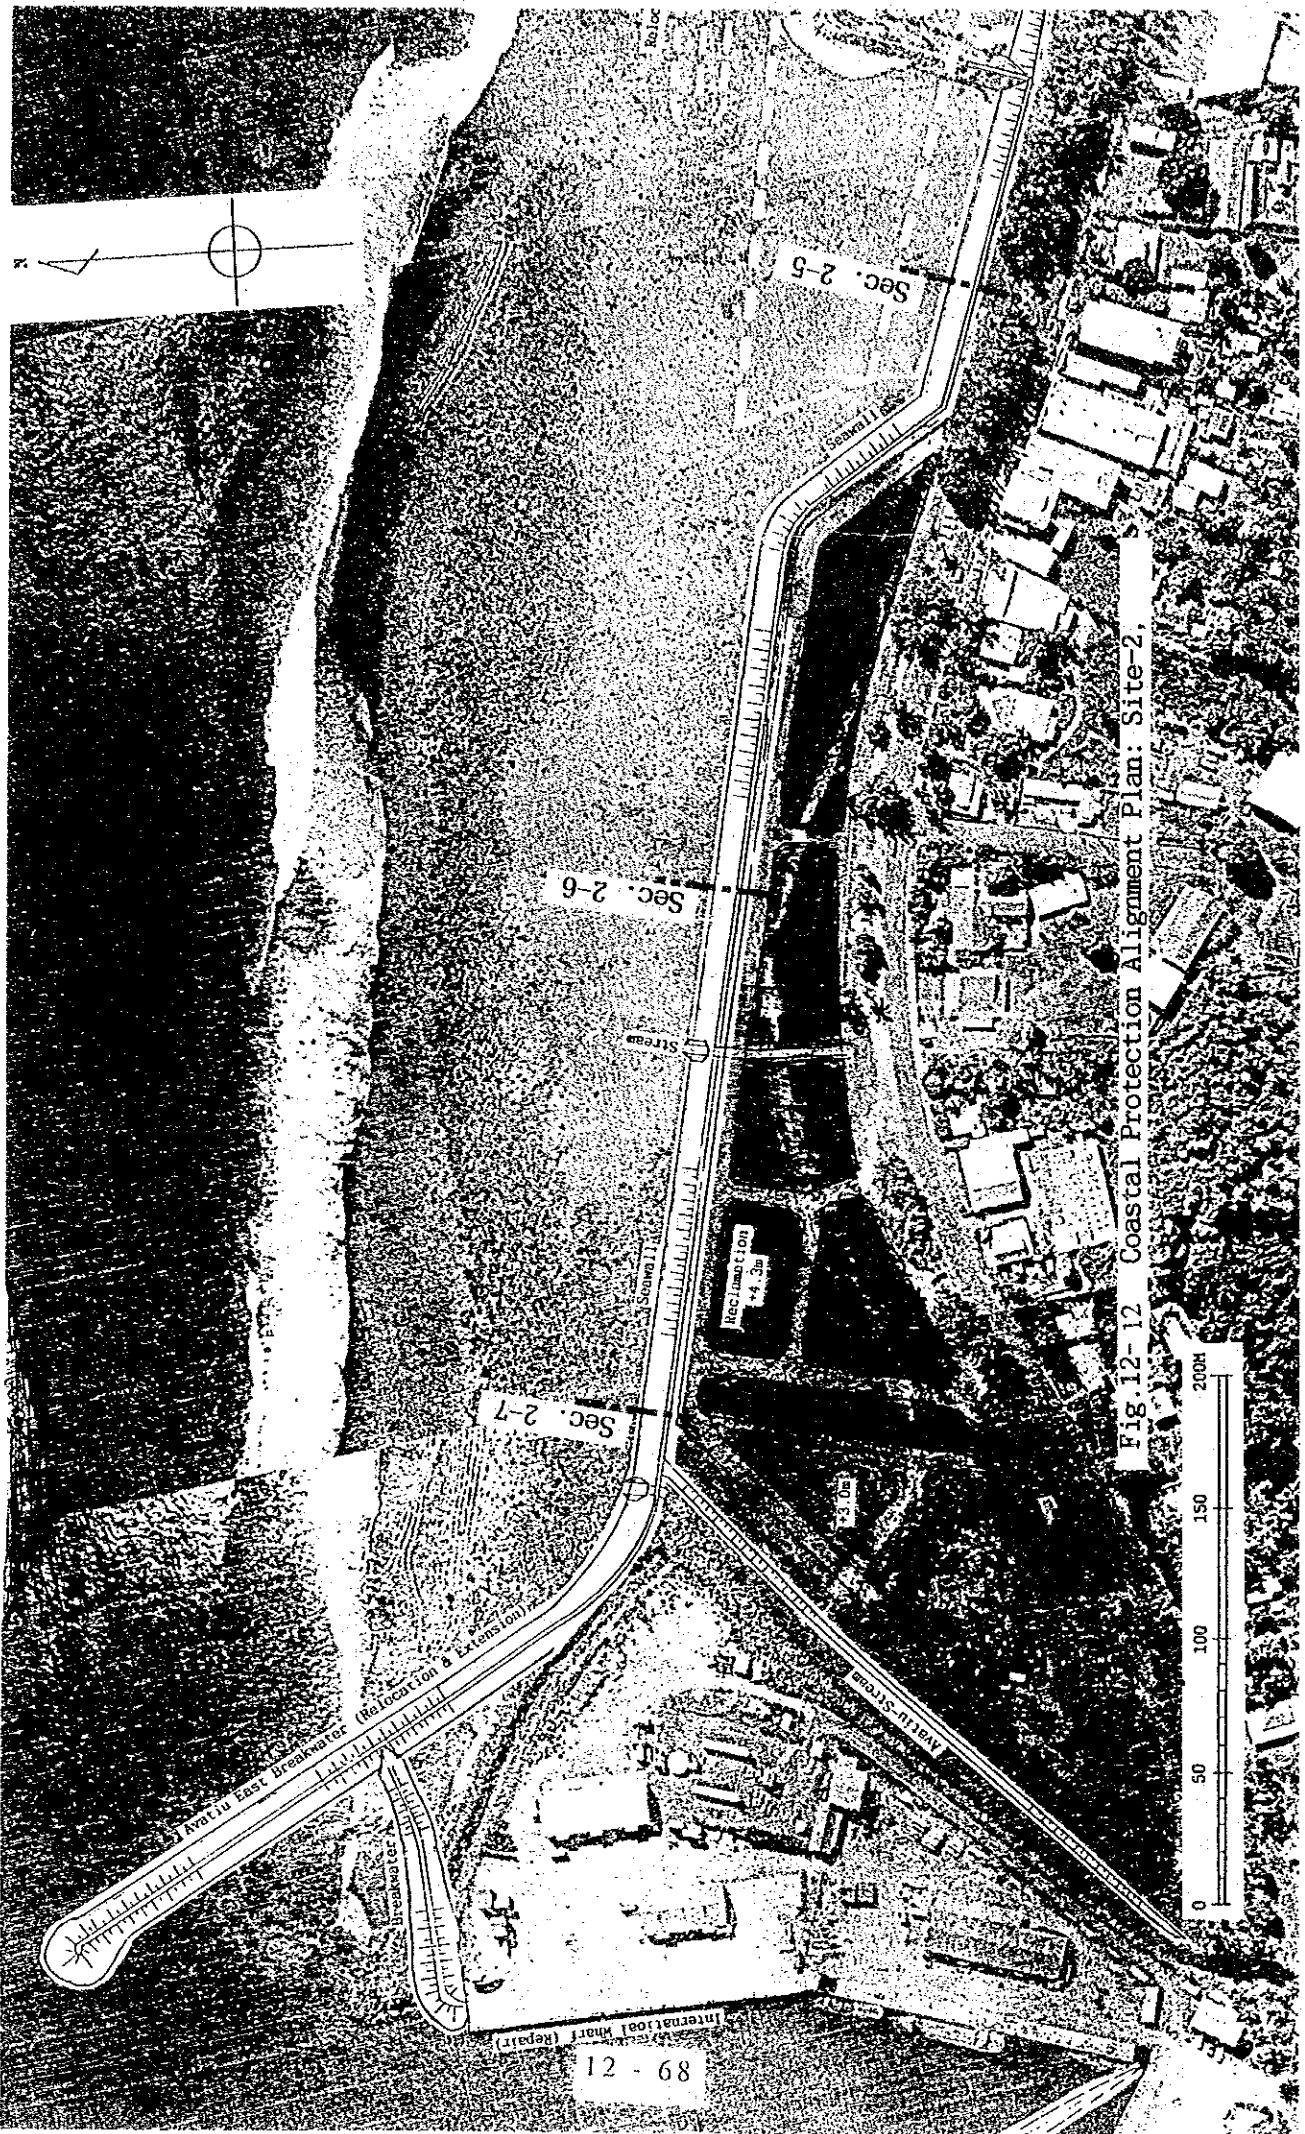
Coastal Protection Alignment Plan: Site-2,
